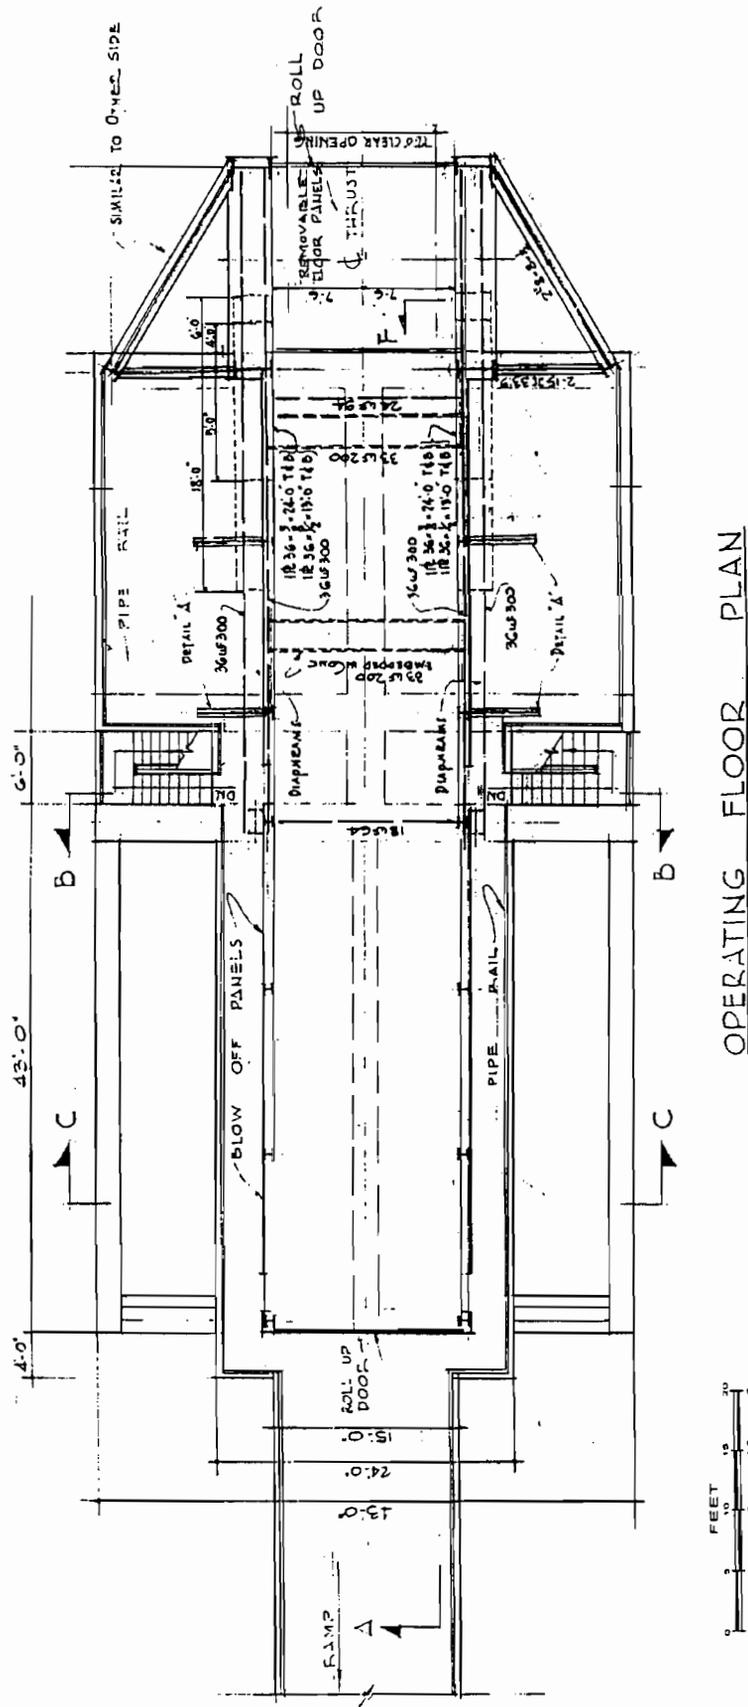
Building 3618, Test Area E-1, Blueprint # DP-142546, detail from Rocket Test Stand E-1, Roof Plans, Frank Grad & Sons, Architects and Engineers, Newark, NJ and Washington, DC. Picatinny Arsenal, Morris County, New Jersey (on file in DPW, Picatinny Arsenal).
